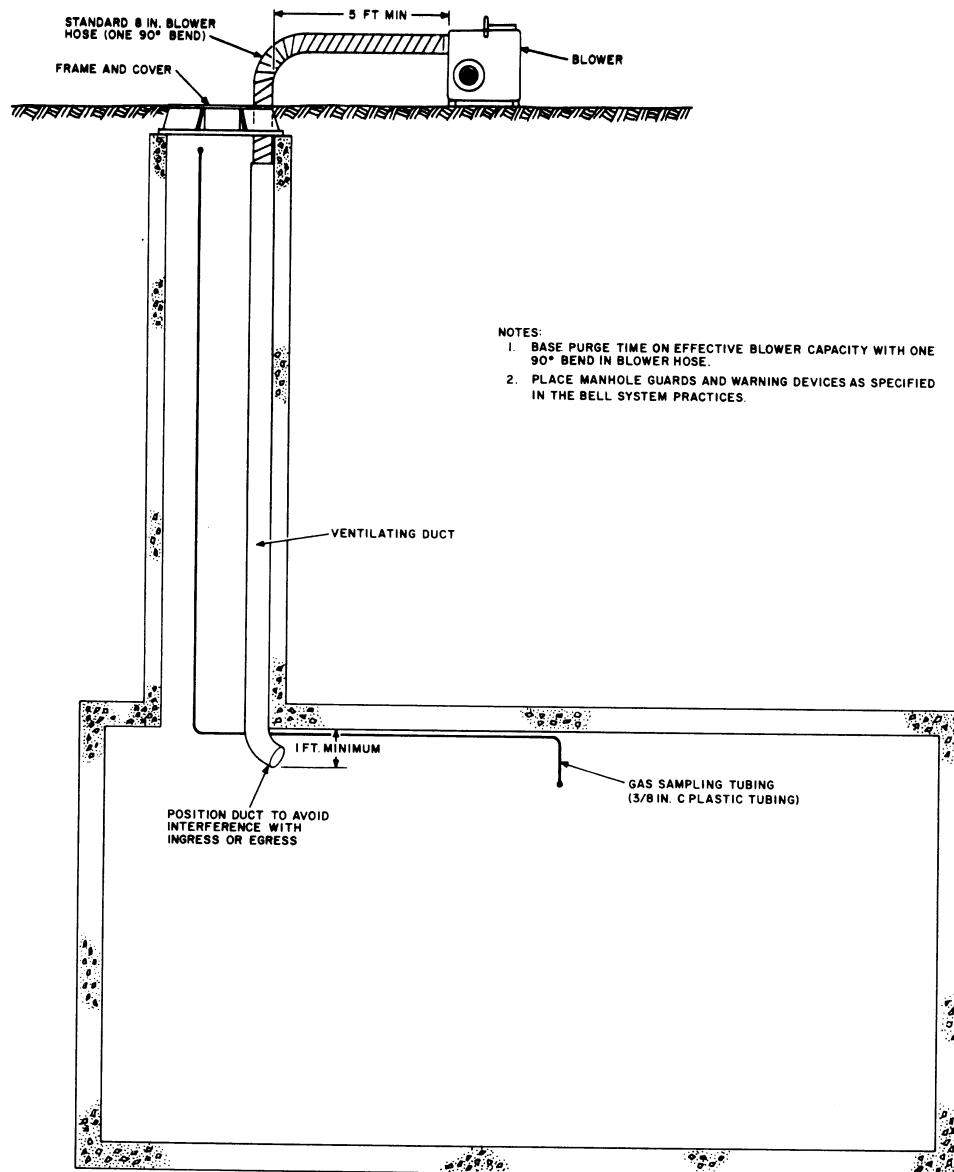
Deep Neck Manhole Ventilated With Permanent Ventilating Duct Installed in Collar
